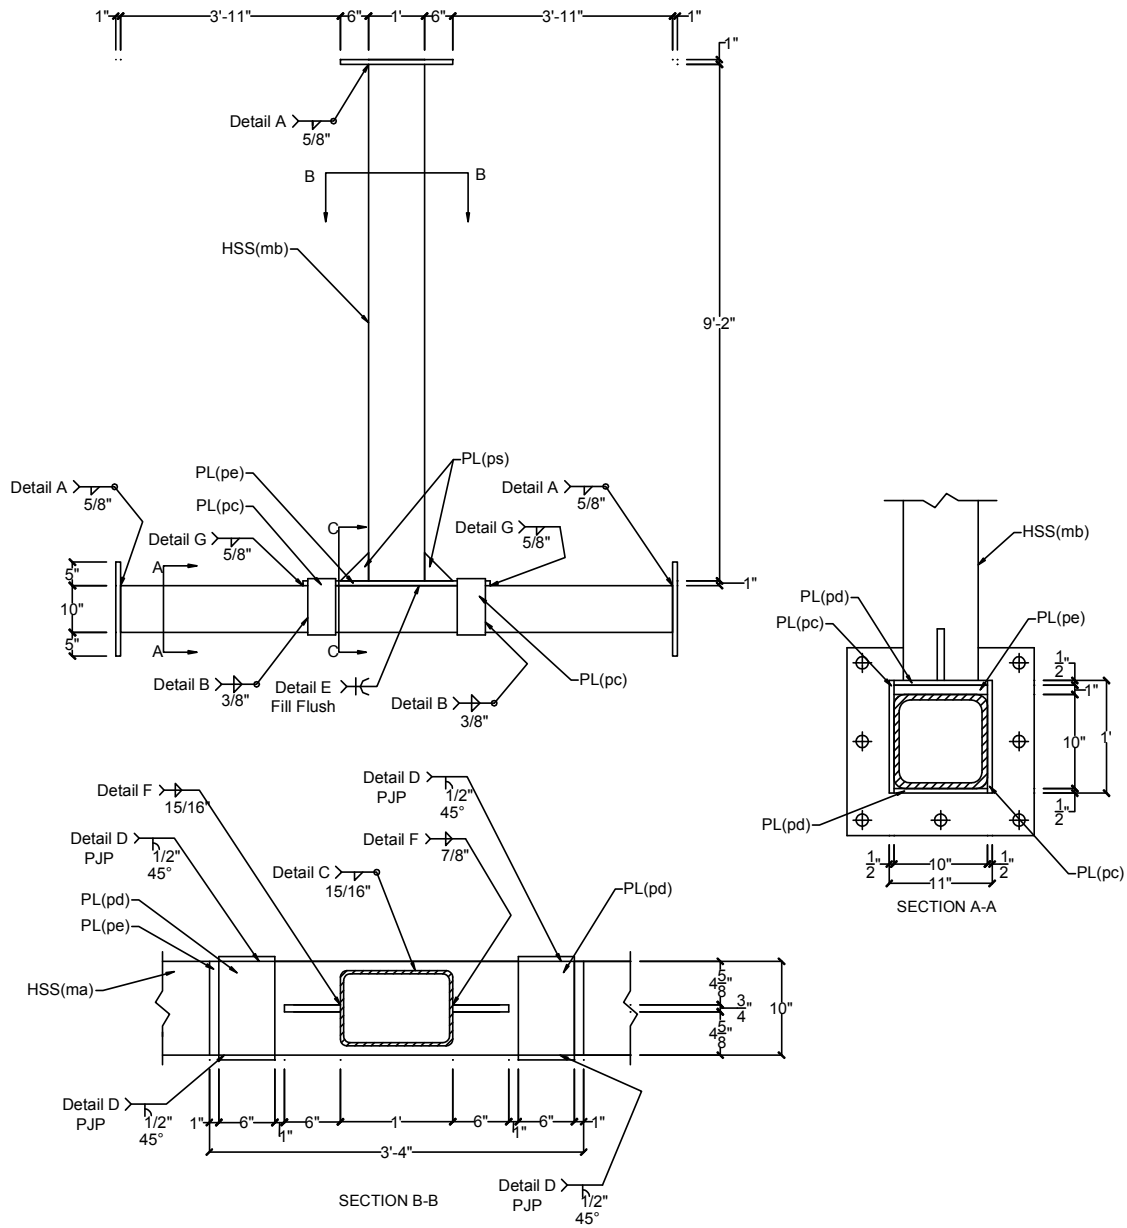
Collar Connection with Stiffeners (units in inch)
